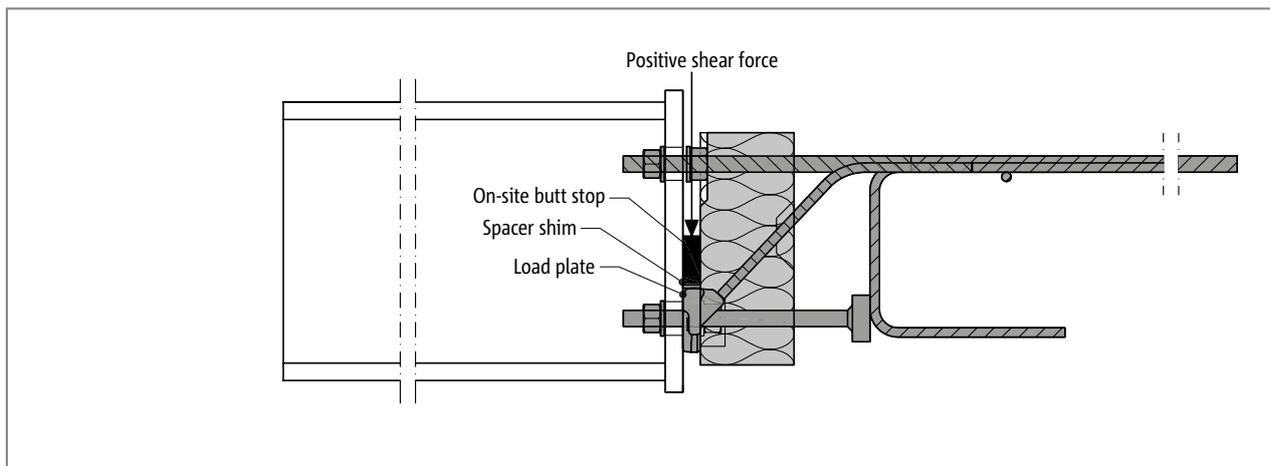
Schöck Isokorb® T type SK: On-site butt stop for transferring shear forces
